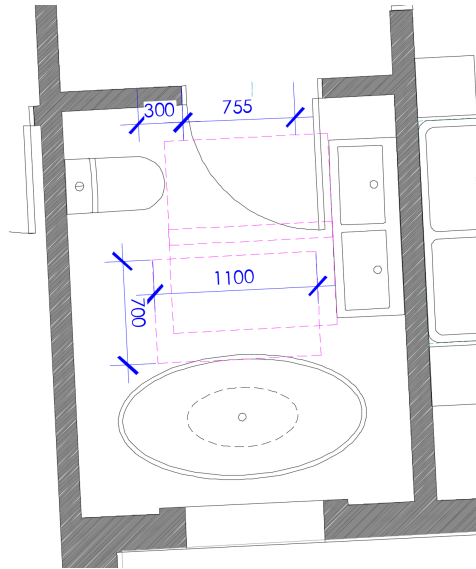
Sample plan of a proposed bathroom within BTM Plots 3-6
